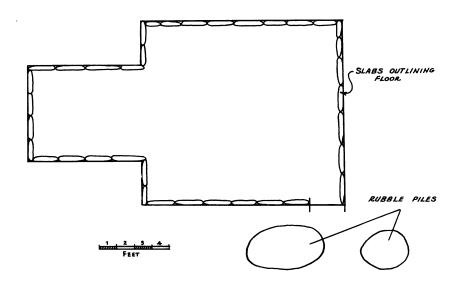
Modern Koniag sweathouse, showing floor plan.
